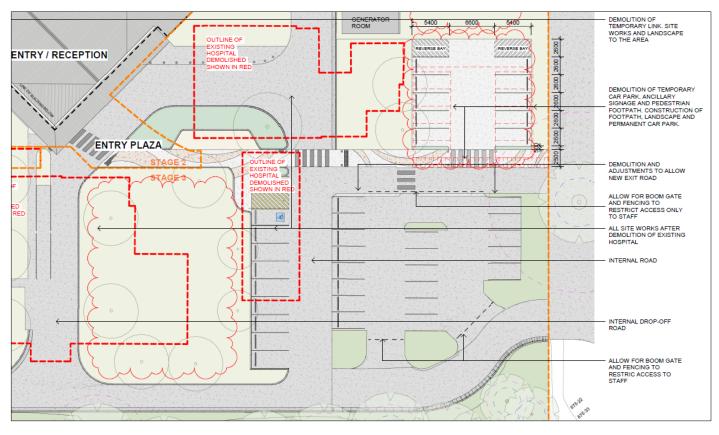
Proposed Amended site plan showing location of carparks and pedestrian paths in the south-eastern section of the site (note – one additional accessible carpark in western carpark not visible under plan label – see the landscape documentation at Appendix E for further detail).
